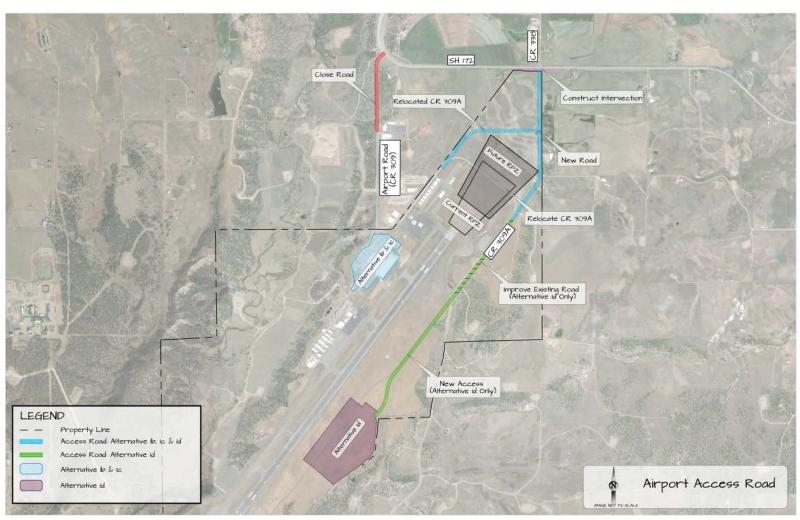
ALTERNATIVE 2B: CONSTRUCT NEW AIRPORT ACCESS ROAD
